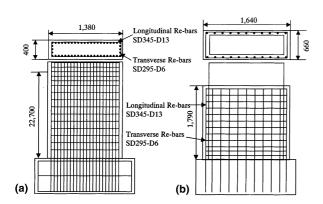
Details of the cyclic loading test speciments for as-built and retrofit wall-type piers: (a) as-built specimen and (b) retrofit specimen.
